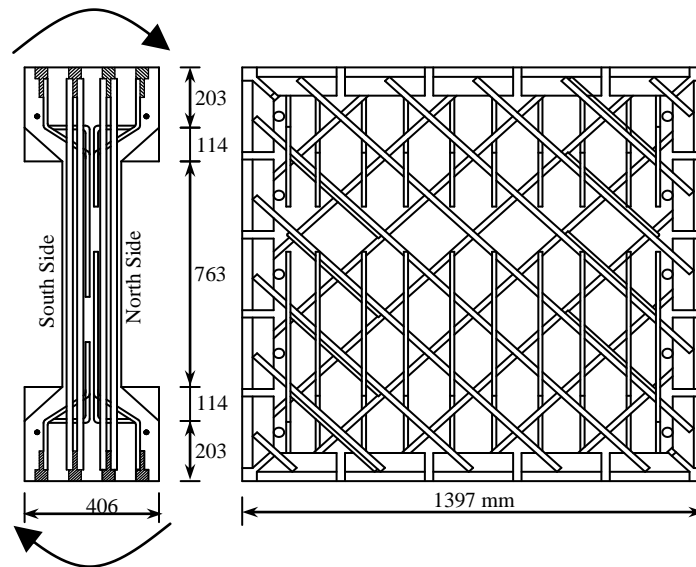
Reinforcement layout of panel OP4 (25.4 mm = 1")
